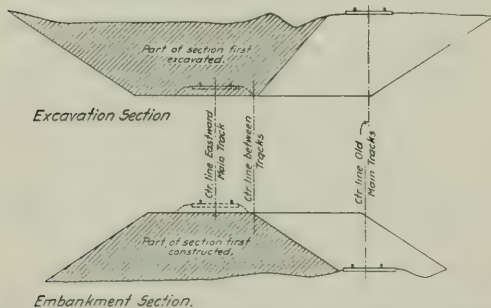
Typical Cross Sections, Showing Method of Making Offset Location.
